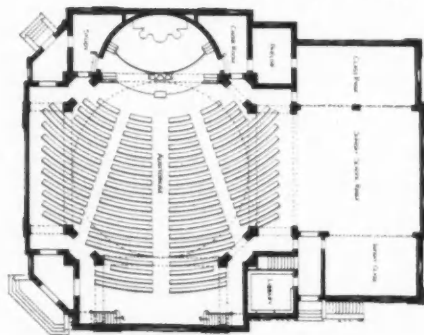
WEST PRESBYTERIAN CHURCH, BINGHAMTON, N. Y. COMPETITIVE DESIGN. GREEK CROSS AUDIENCE HALL PLAN. H. S. Gardner and A. B. Lawyer, Associate Architects.
